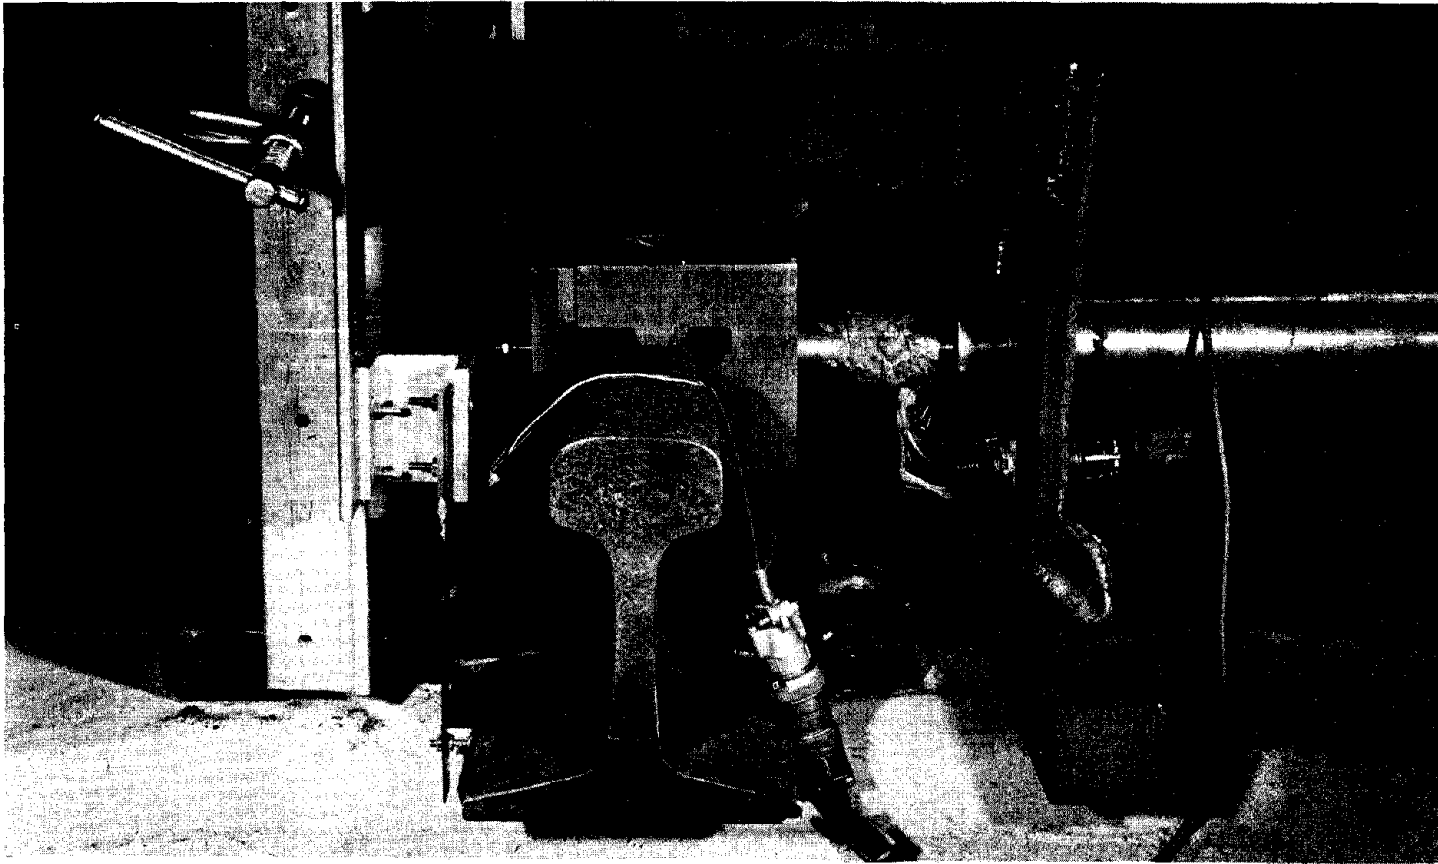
Test Set-Up for Fastener Resistance Test on Concrete Ties About the Longitudinal Axis, Showing Load Application Arrangement and Instrumentation.
